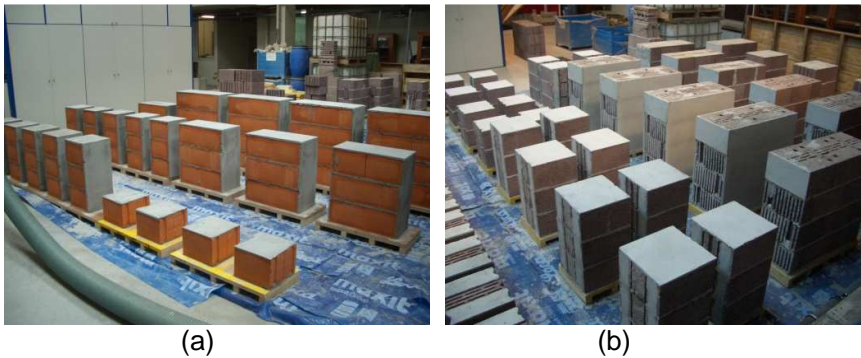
General view of masonry samples constructed in laboratory: a) clay masonry and (b) lightweight concrete masonry
